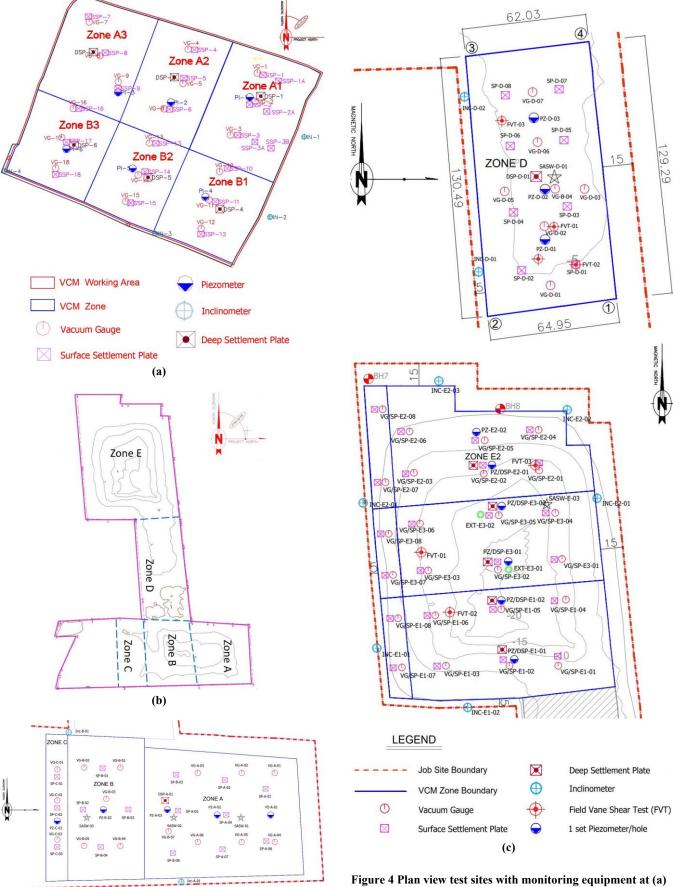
Plan view test sites with monitoring equipment at (a) Grandio Site (b) Noble Wisdom site (c) Nobel wisdom site separated into different zones
